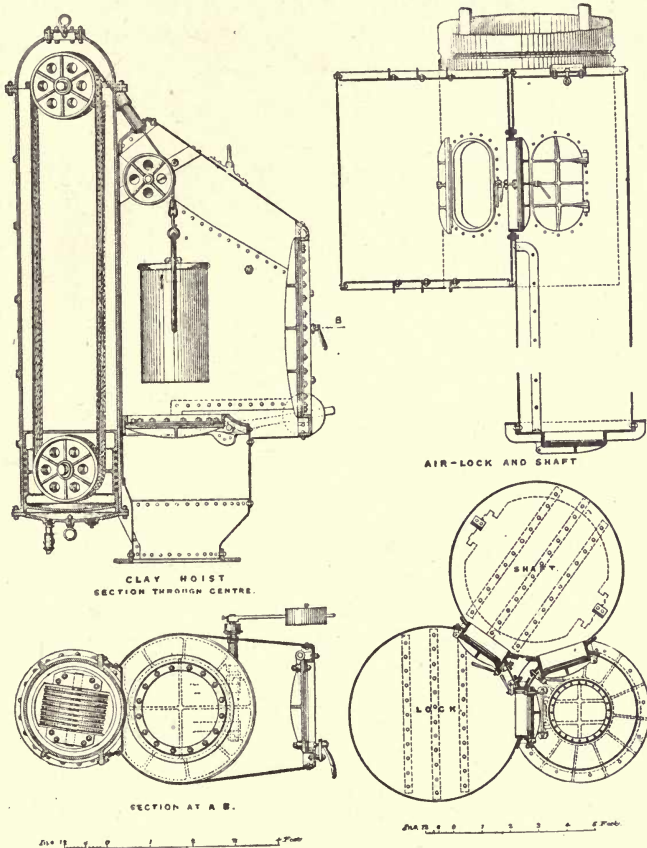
FIG. III.—Memphis Bridge: Details of Air-lock and Hoists.
